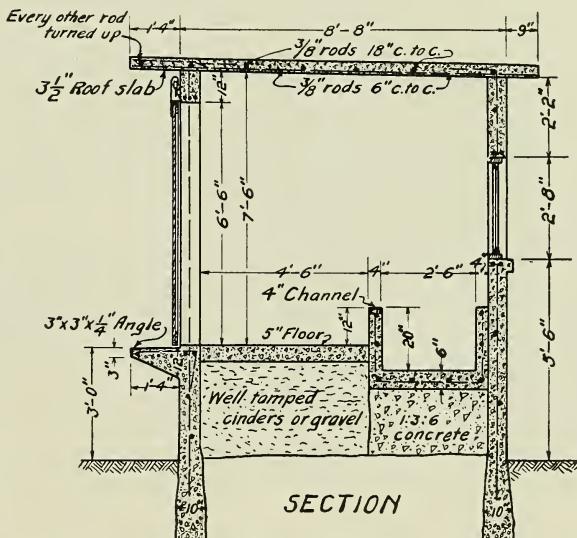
Reinforced Concrete Milk House with Loading Platform—Sectional View.
